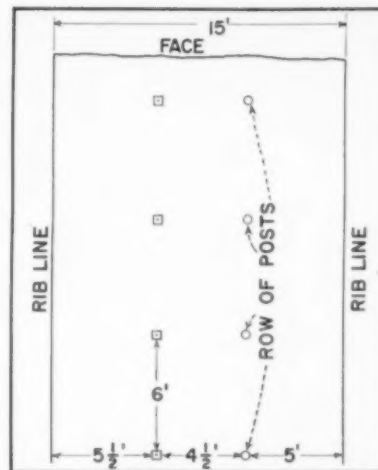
TIMBERING PLAN, 15-ft rooms, bolts on 6-ft centers, No. 3.
